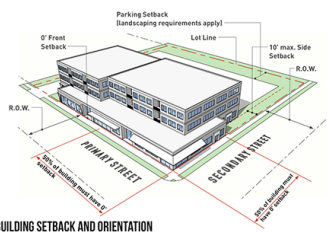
BUILDING SETBACK AND ORIENTATION
